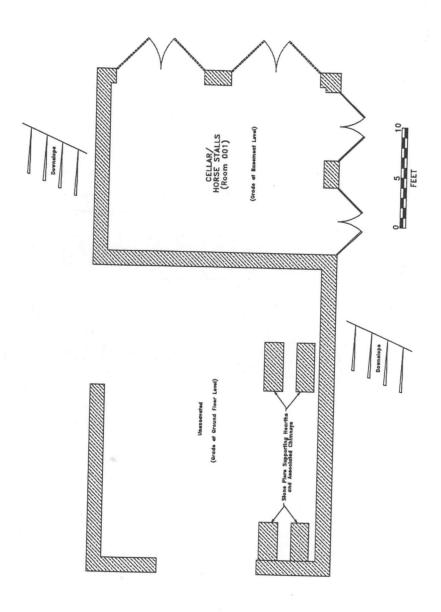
Basement and foundation plan of the Baumbauer Blacksmith Shop, as originally constructed.
